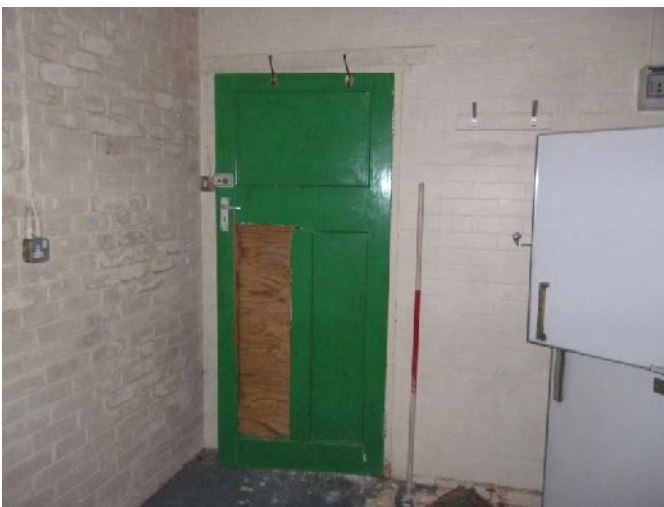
(left): East elevation of West Building, Ground Floor Room 5
